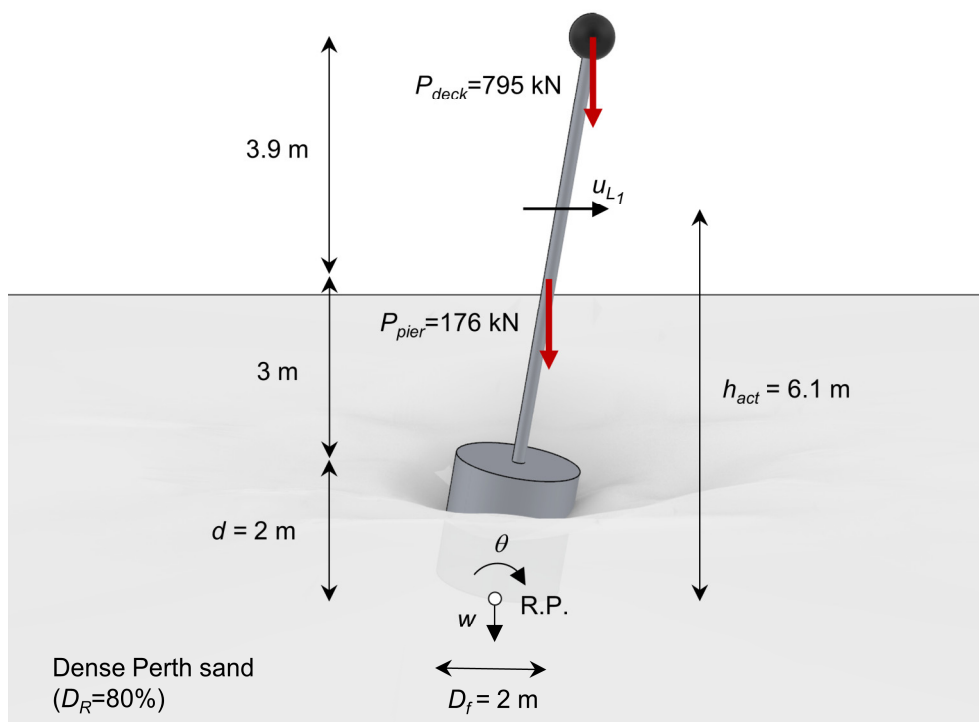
Problem definition: SDOF bridge pier under lateral pushover loading.
